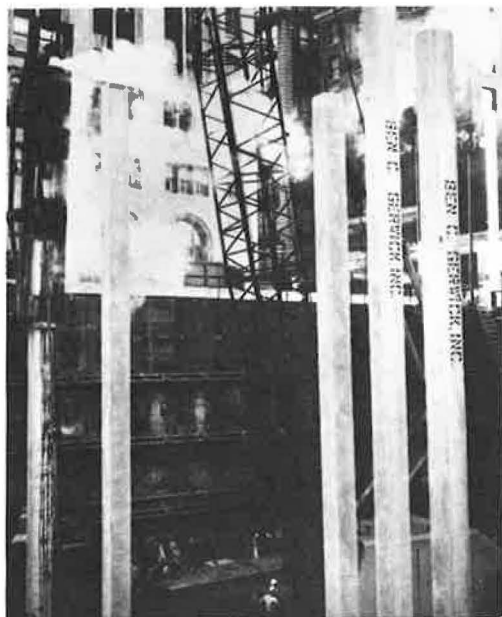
High-capacity prestressed concrete piles used in Wells-Fargo Building, San Francisco.
